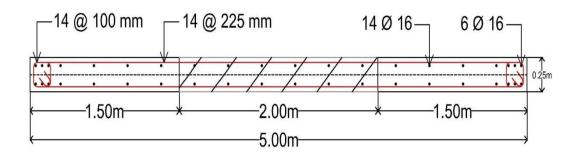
Steel reinforcement of shear wall with opening 2.0mx2.0m (Window)
